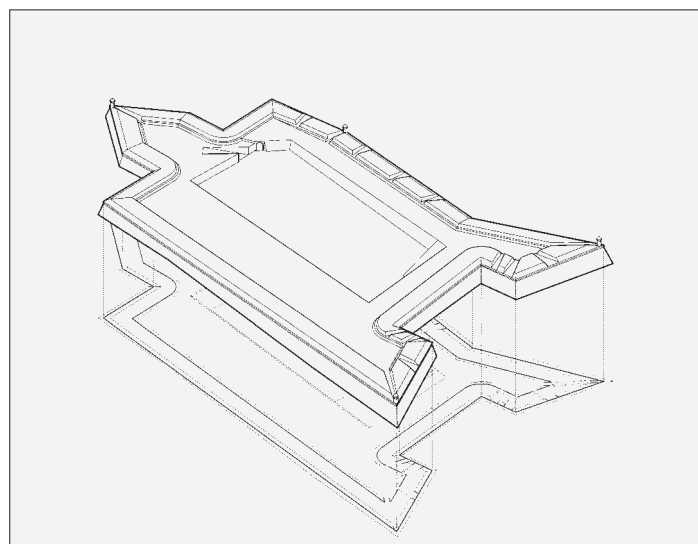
GRIPE FORTRESS, 2ND CONSTRUCTION STAGE, 1656-1657, PLAN AND PERSPECTIVE VIEW
